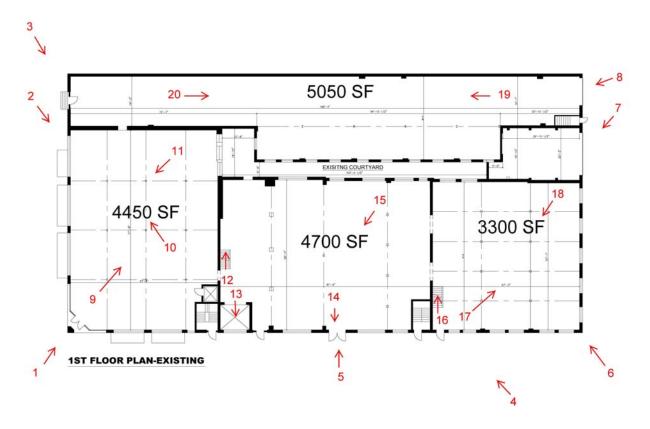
A: Site and First Floor Plan Exterior and Interior Photo Key.
